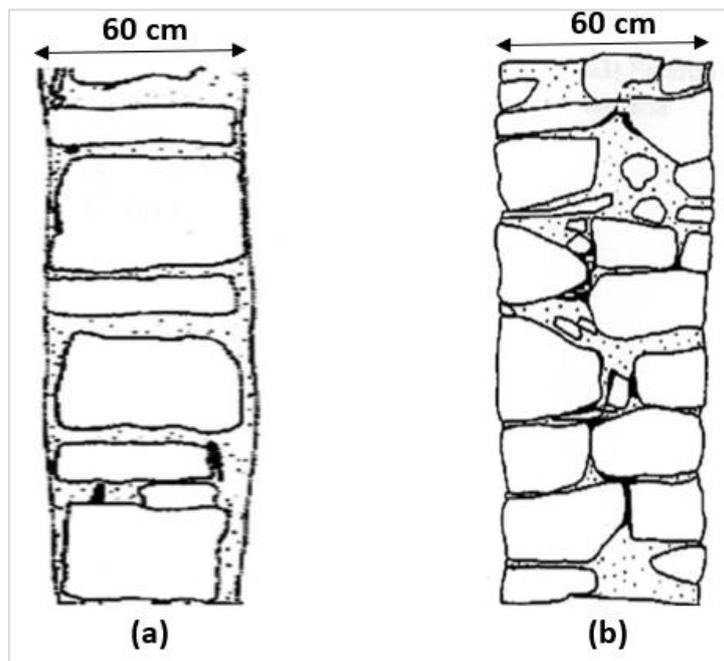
Typology of Dana's walls: (a) single-layer walls; (b) double-layer walls (Al Haija 2011, adapted by the author 2019)
